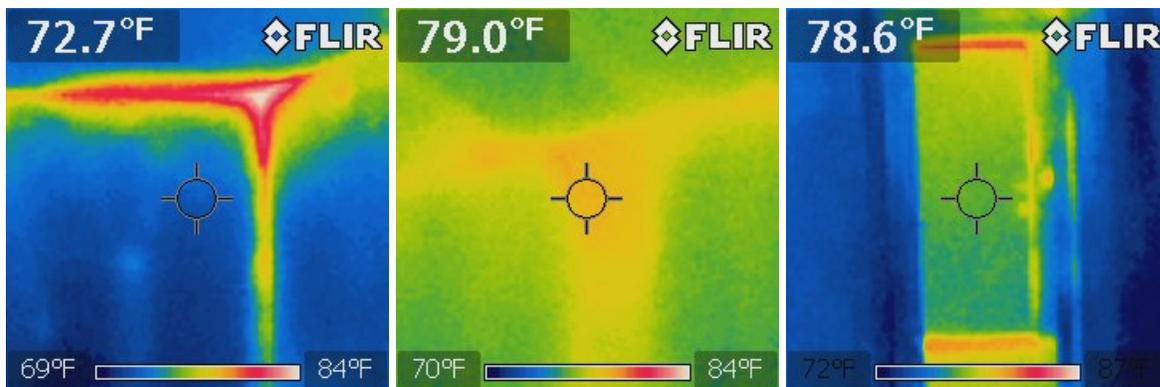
(Left) Top plate corner leakage; (center) kitchen exhaust ducting through interior wall without backdraft damper; (right) leakage around garage door from lack of weather stripping
